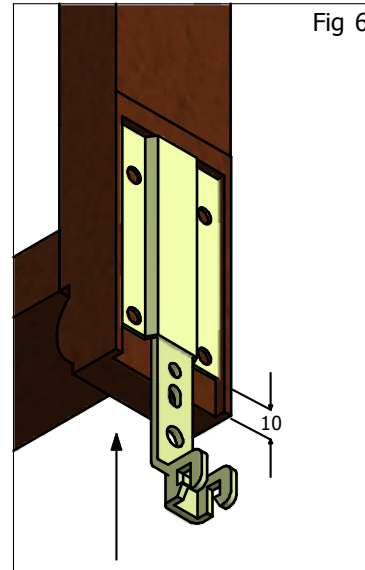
The bottom edge of the UK121 bracket must be 10mm up from the sash or horn depending on which is applicable.
